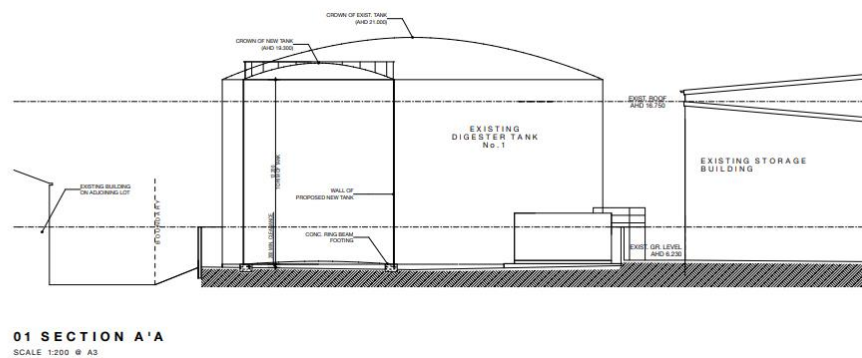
Finishes Schedule and Section of proposed tank (Source: James Gatley Architects)
